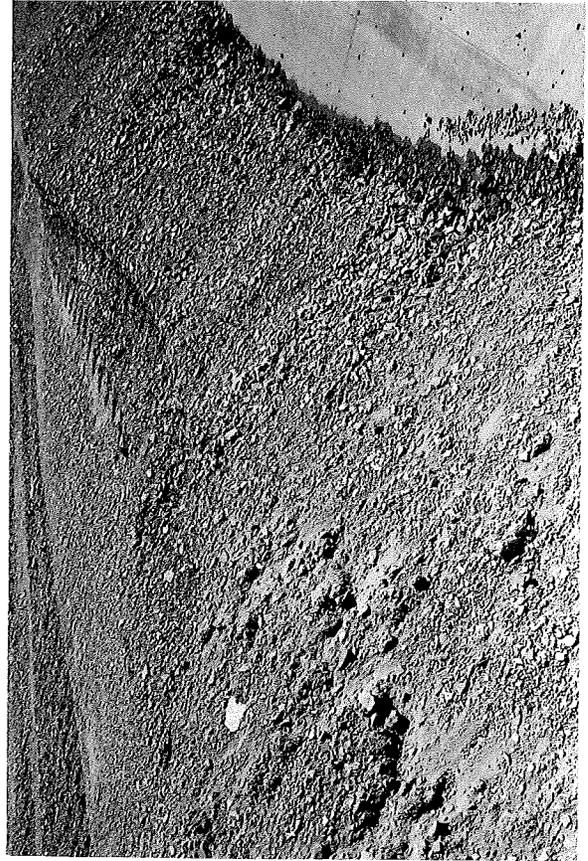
Stockpiled material planed off concrete pavement by CMI.
